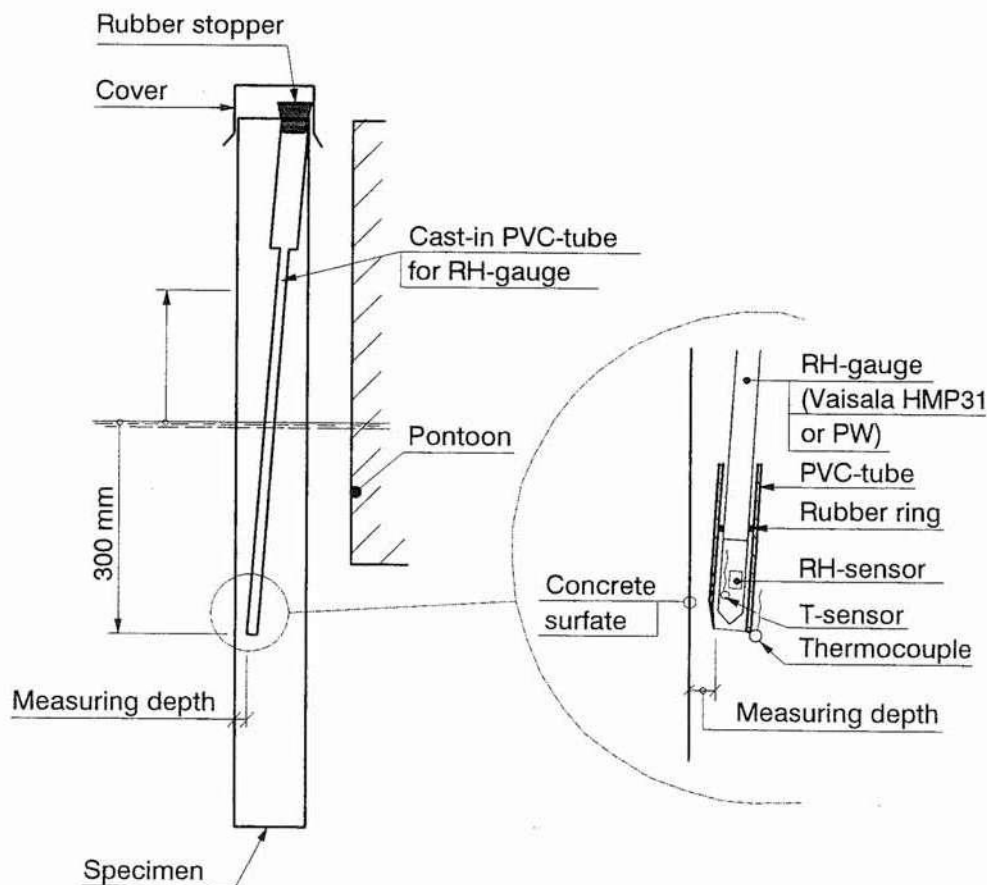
A concrete slab attached vertically to the pontoon and submerged 0.6 m below the water table. Cast-in tubes for in situ measurement of RH.
